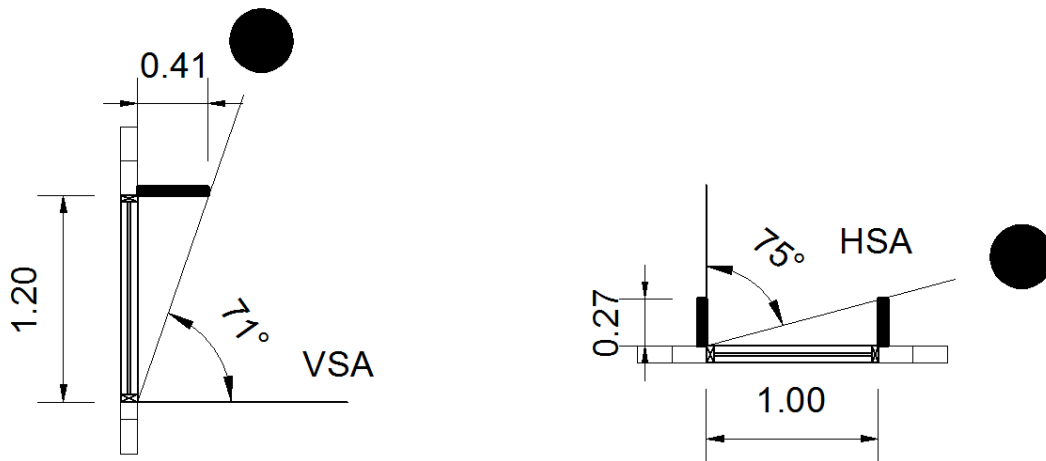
Shadow angles and their corresponding shading elements, Mexico city. Profile view of the south façade (left), View from above of the north façade (right).
